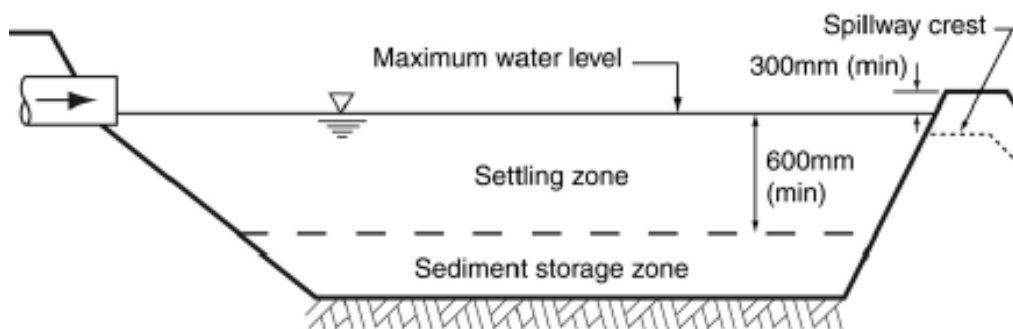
Typical type D sediment basin cross-section (Source: IECA, 2008)
